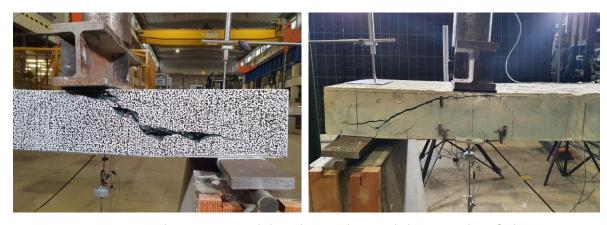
Shear tests on slabs: observed critical shear crack at failure
